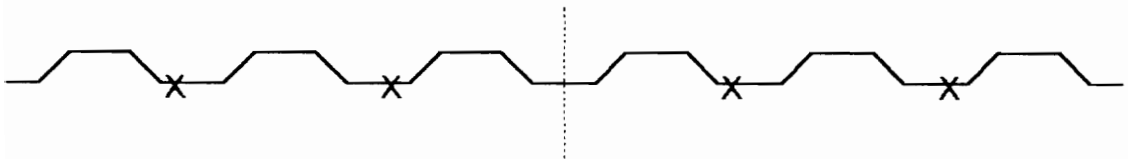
SDI-2/20-4-9 Concrete Strain Gage and Shear Stud Locations
